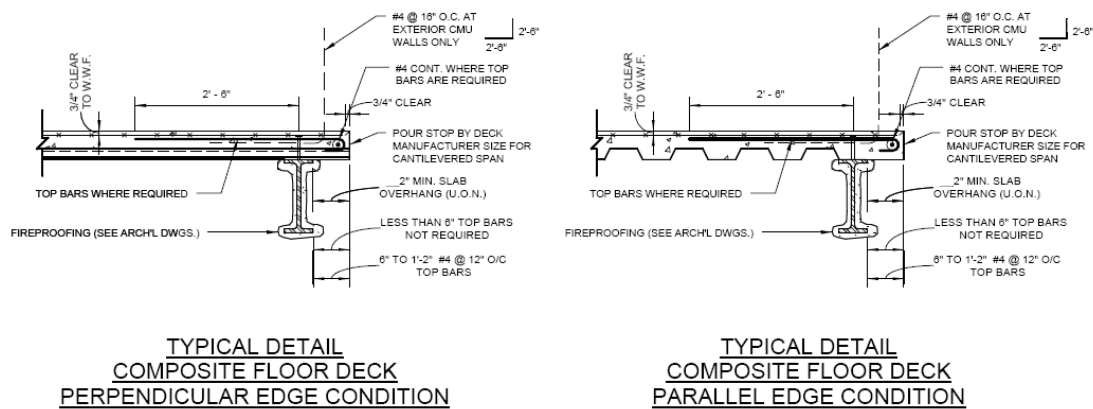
TYPICAL SLAB ON DECK FLOOR SECTIONS. DRAWINGS NOT TO SCALE. DETAIL COURTESY OF TURNER CONSTRUCTION.
